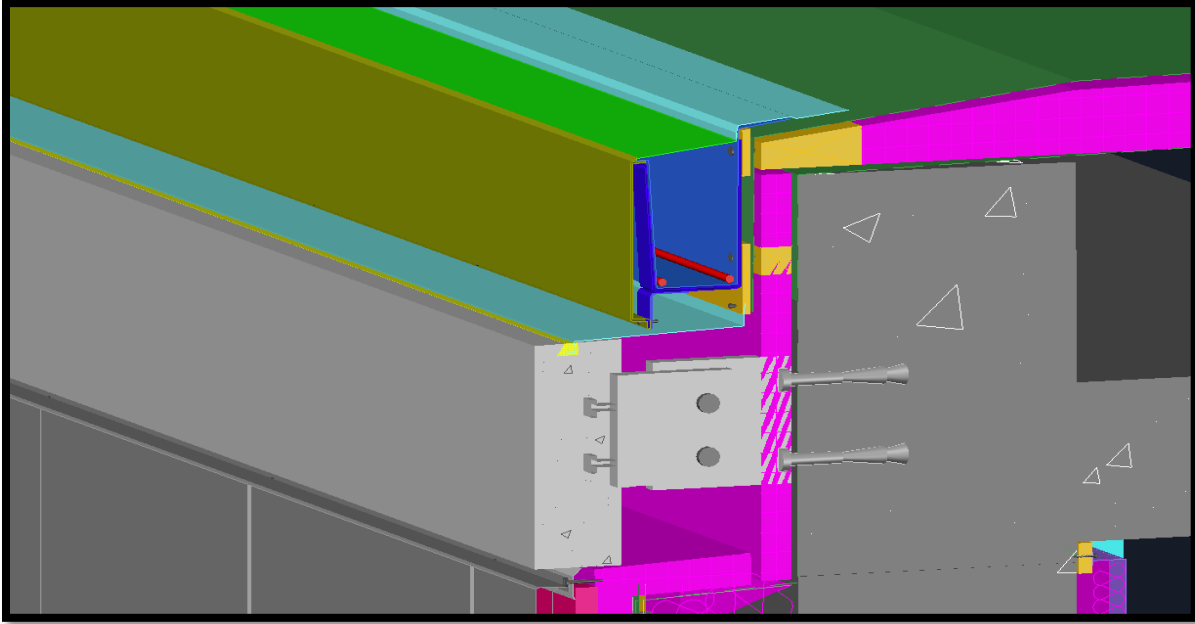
Another view of Figure 6-4 showing how the arch. conc., gutter system, insulation, roofing, water proofing, metal panels, and gypsum board are connected to the concrete wall.
